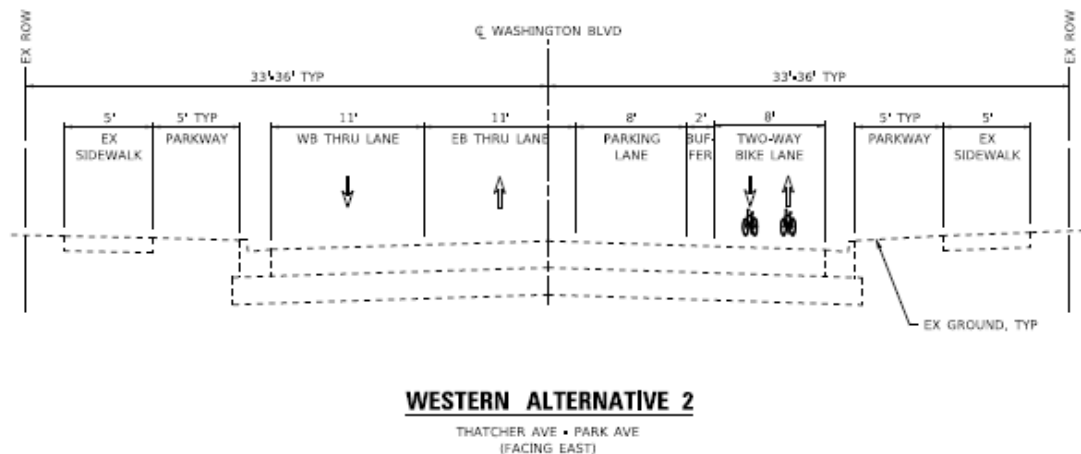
Western Typical Section Alternative 2 Washington Blvd.
